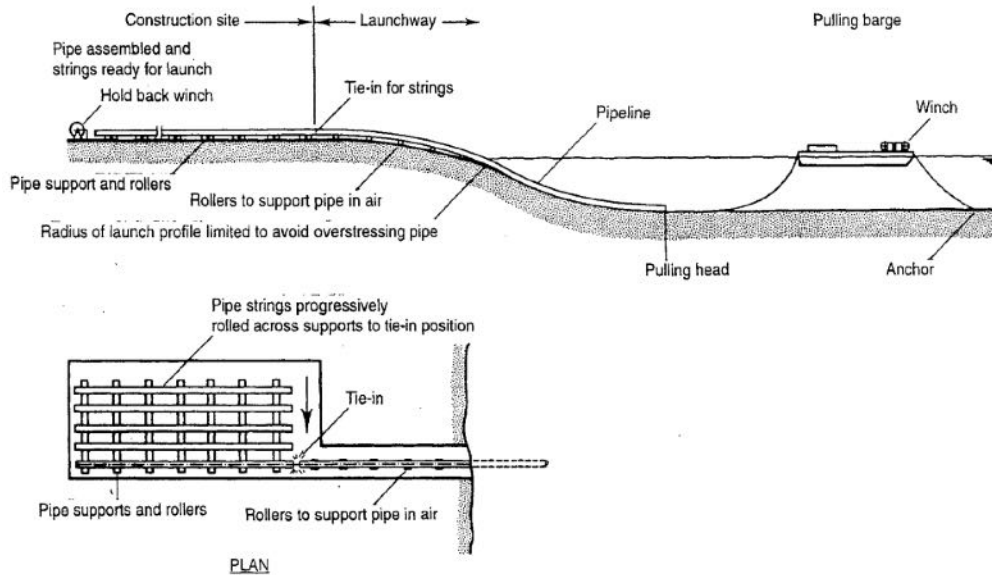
Bottom pull method of installing the outfalls (Source: CIRIA¹⁰)
